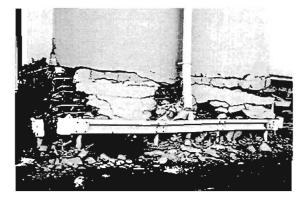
Pier on East Approach to the Maya Ohashi Bridge on the Harbour Highway closeup of pier in centre of Plate 6.40 - this is the second pier from the east main pier, and suffered severe damage in accommodating the distortion at the main bridge pier.
